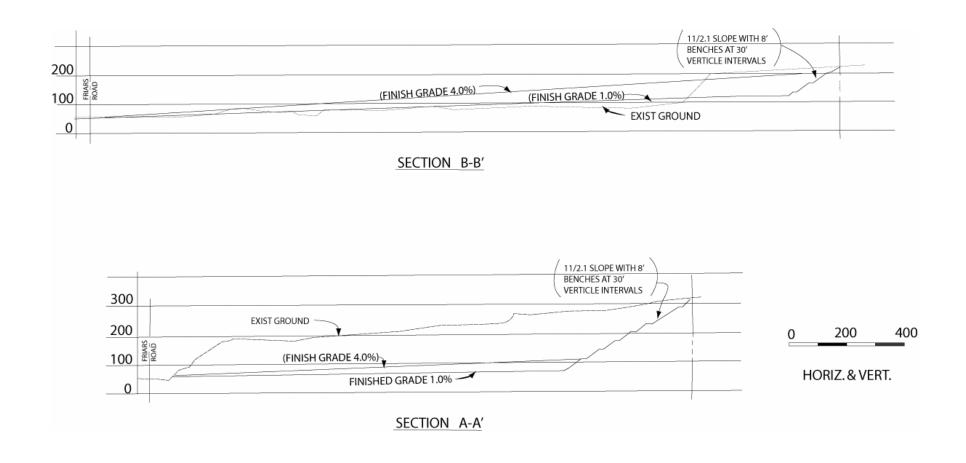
Existing Approved Reclamation Plan Cross-Sections
